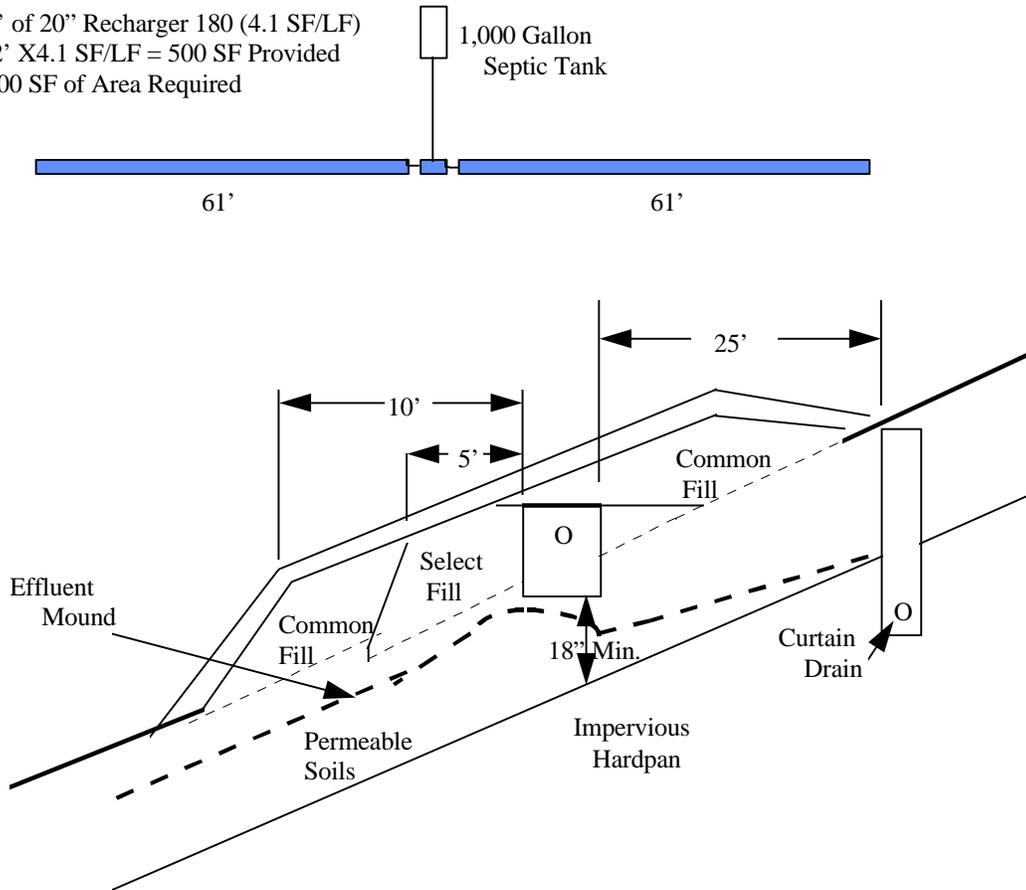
Trenches Spread On Slope Over Impervious Hardpan
